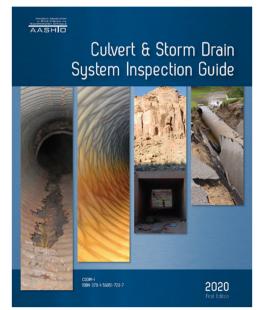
AASHTO Culvert and Storm Drain System Inspection Guide (2020)
